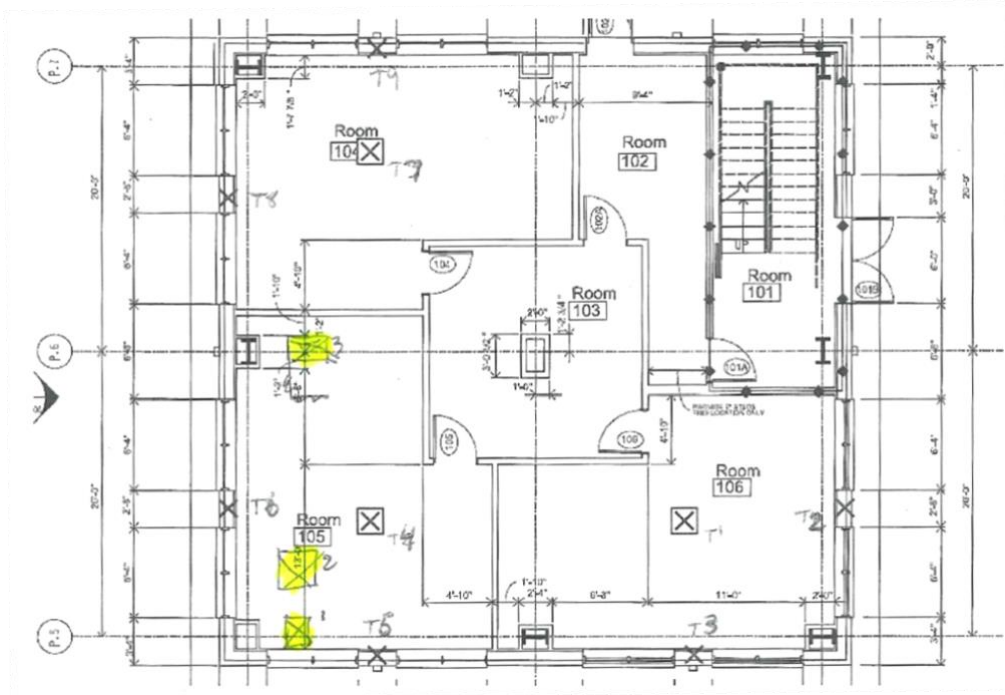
Floorplan and HVAC system layout of FRP (Source: (Im, Bhandari, and New 2016))
